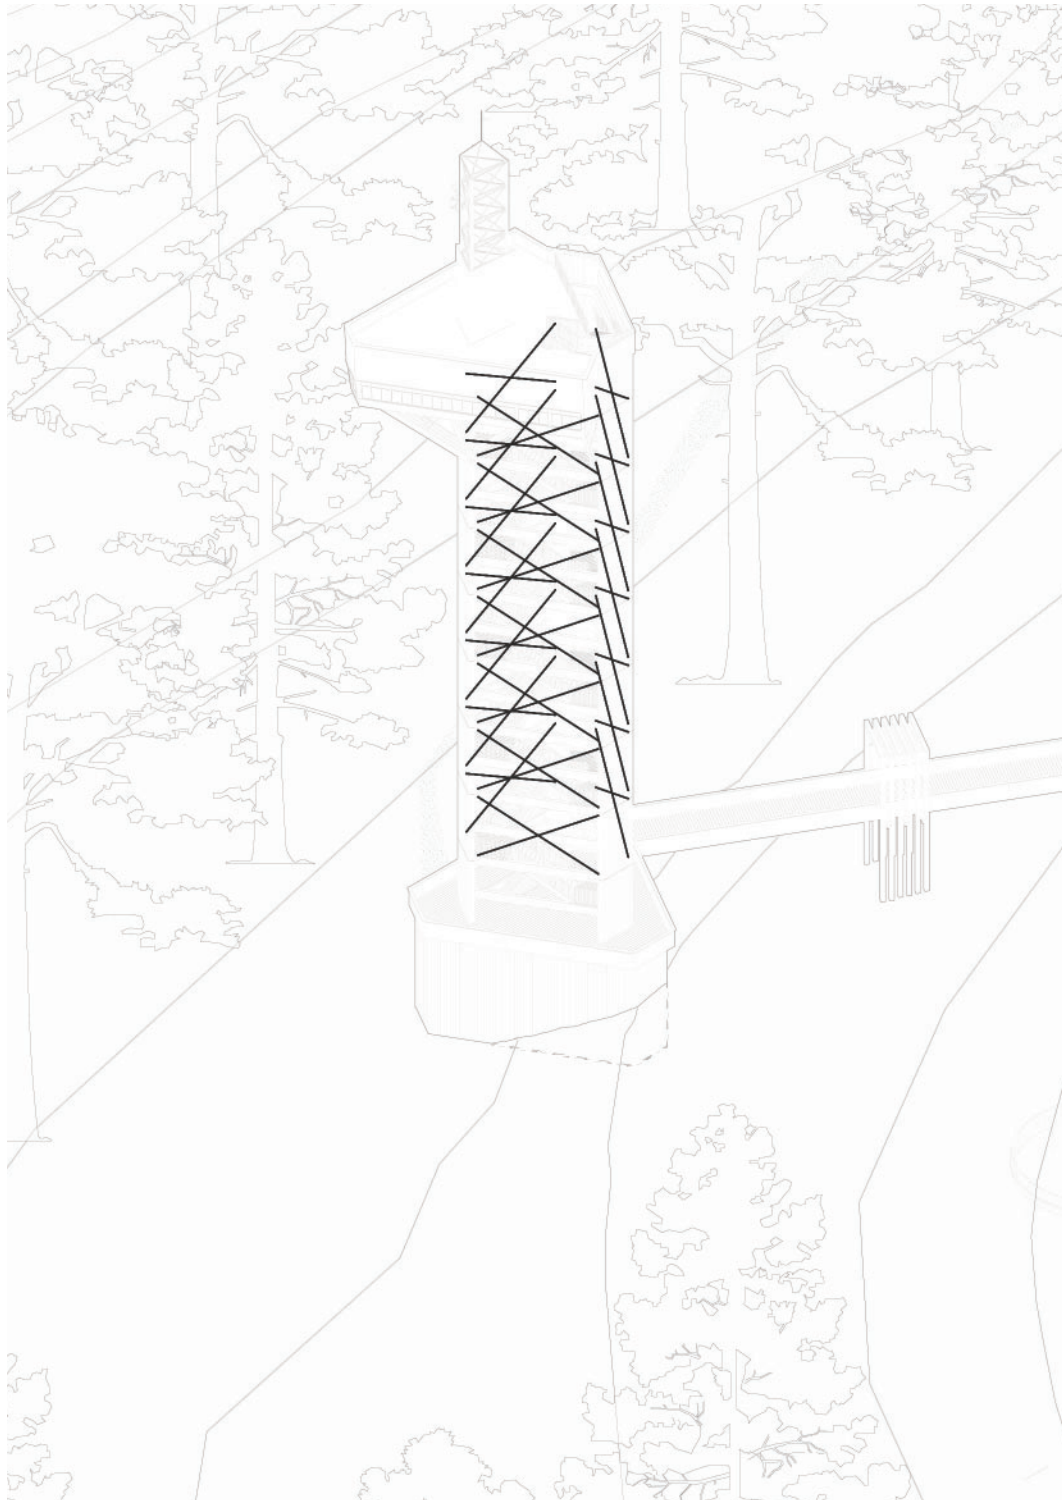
Structural Diagram: Steel Cable Cross Bracing
